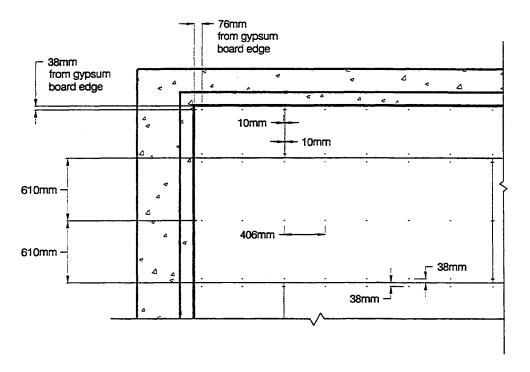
Screw pattern for base layer gypsum board layout, resilient metal channels 406 mm o.c.
